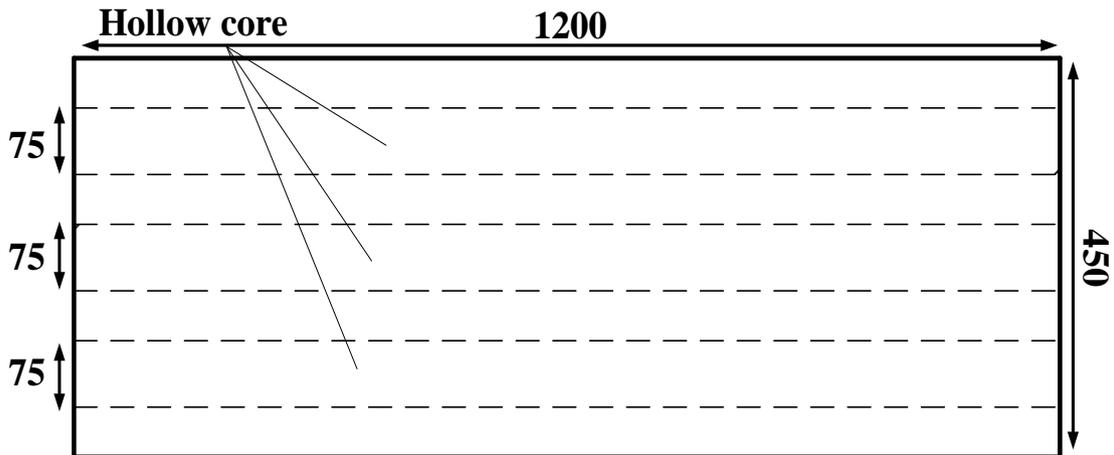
The Details of Top View of all HCS Specimens (all dimensions in mm)
